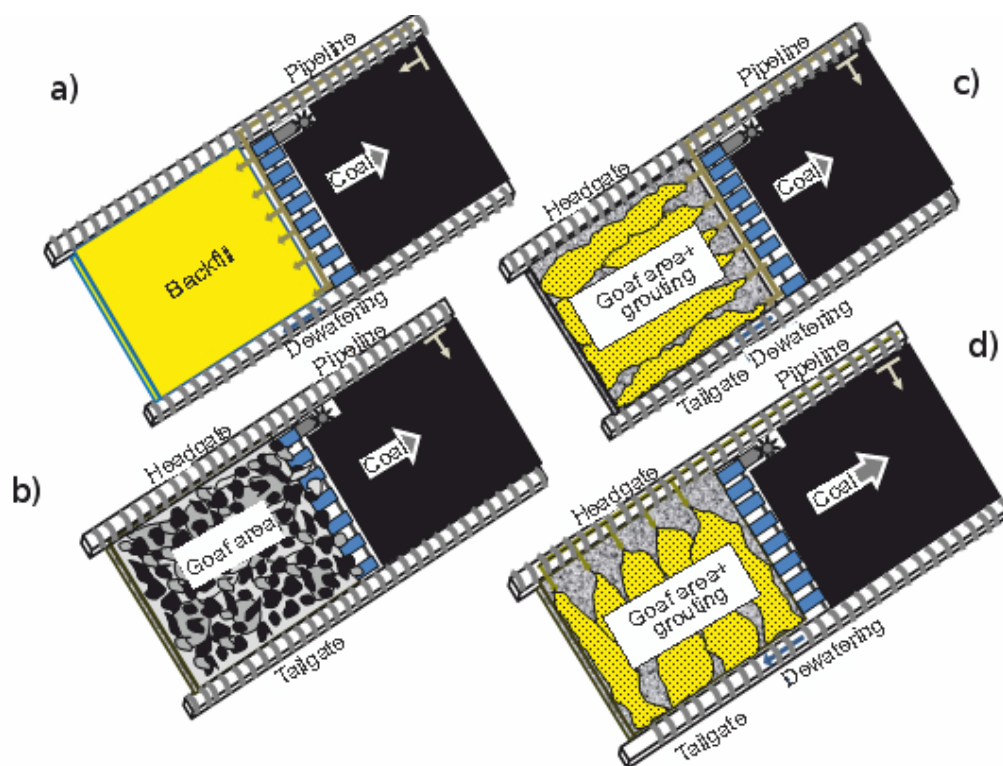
Longwall methods used in Polish underground coal mines; a) longwall with backfill, b) longwall with caving, c,d) longwall with goaf grouting – 2 methods (Palarski, J 2013)
